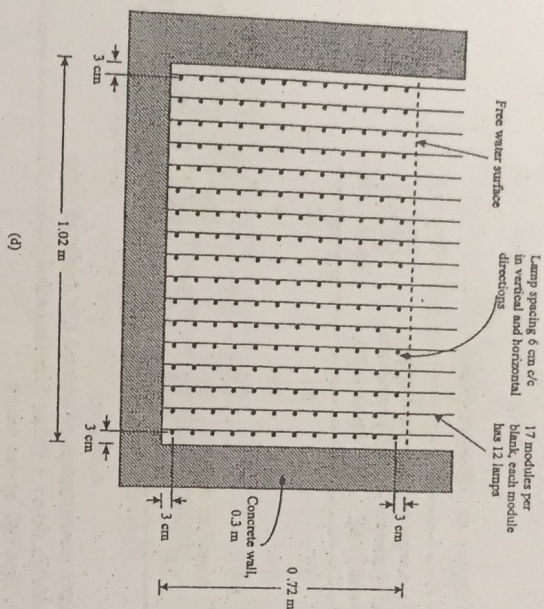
cont'd (d) details of modules and lamp arrangement.
